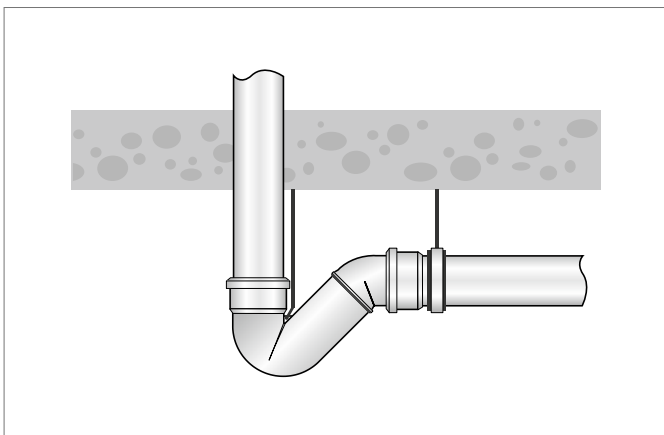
RAUPIANO PLUS P-trap size DN 110 supported with clamp and hook
